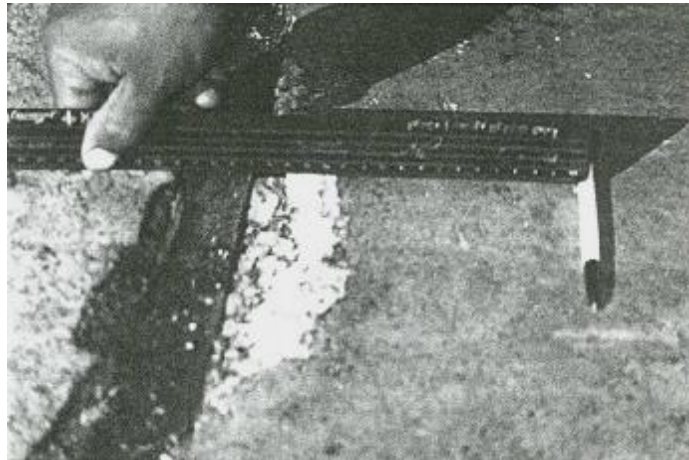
Circular Cracks Around the Corner of R.C. Slabs & Defects in Expansion and Shrinkage Joints.
